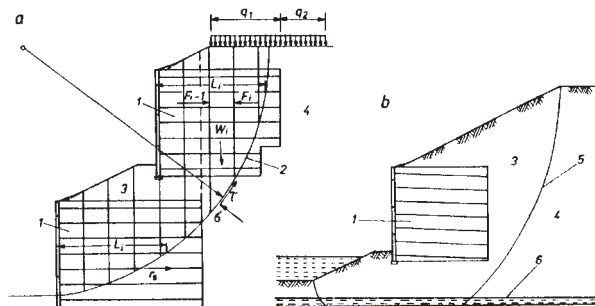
Schemes of general stability control [1]: a - destruction along cylindrical surface, b - special case of destruction; 1 - reinforced soil mass, 2 - circular line of soil destruction, 3 - destruction zone, 4 - zone outside the destruction area, 5 - non-circular line of soil destruction, 6 - weak base layer
